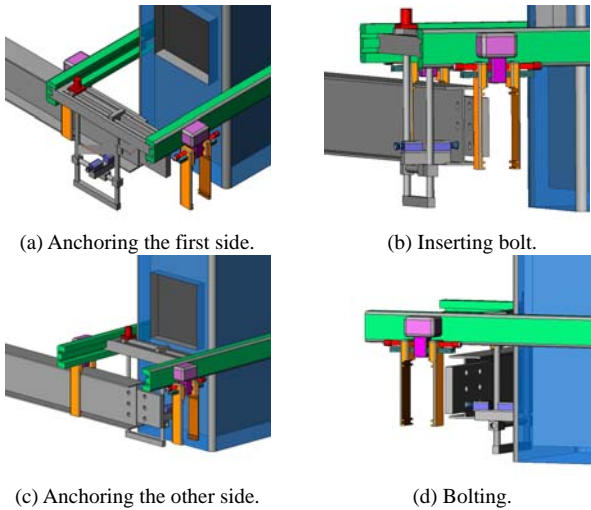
Bolting operation sequence of bolting mechanism Ver. 1.
